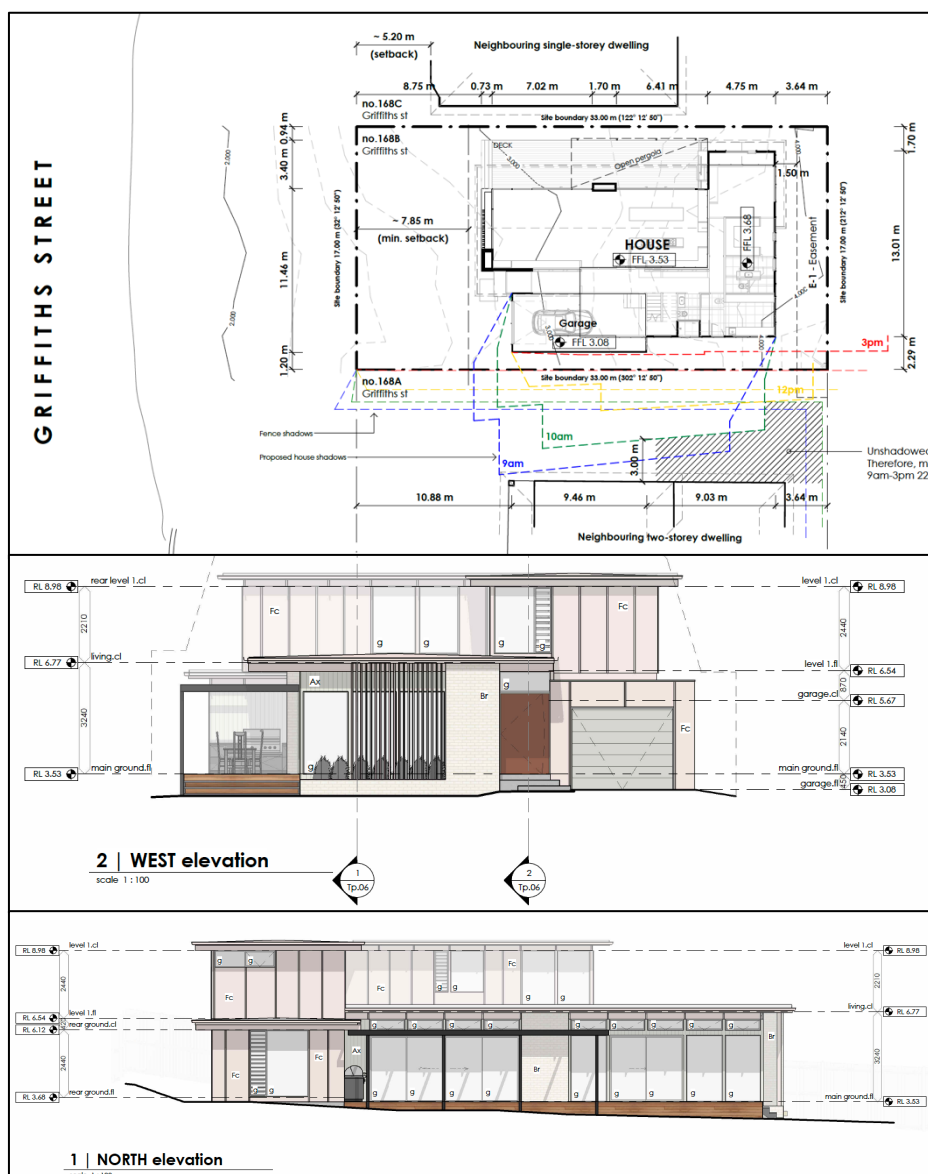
PREVIOUS Site plan, North & West elevation plans
